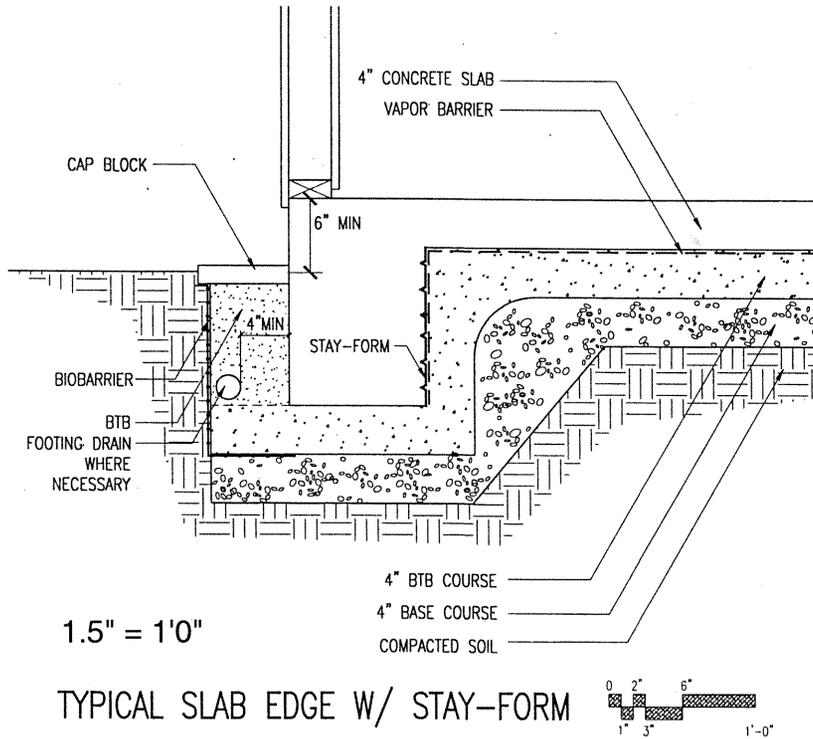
Monolithic concrete slab edge with Stay-Form installed to increase the BTB angle of repose.
